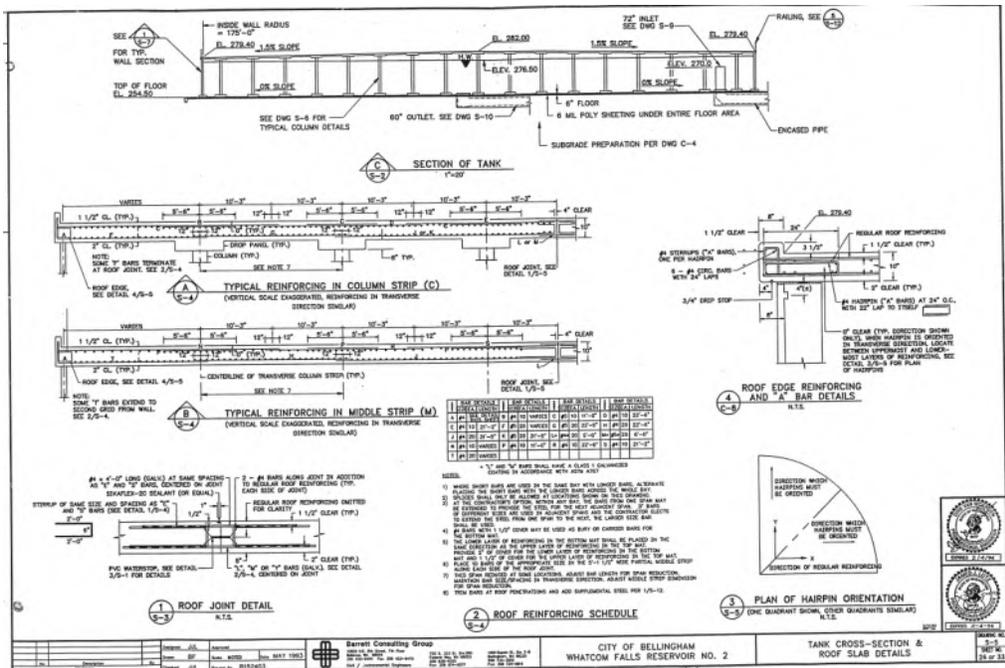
Whatcom Falls 2 - Tank and Roof Cross Section and Details
